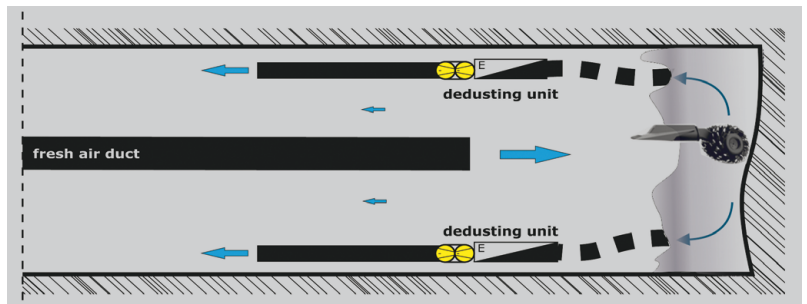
Plan view illustrating the basic principles of tunnel ventilation
